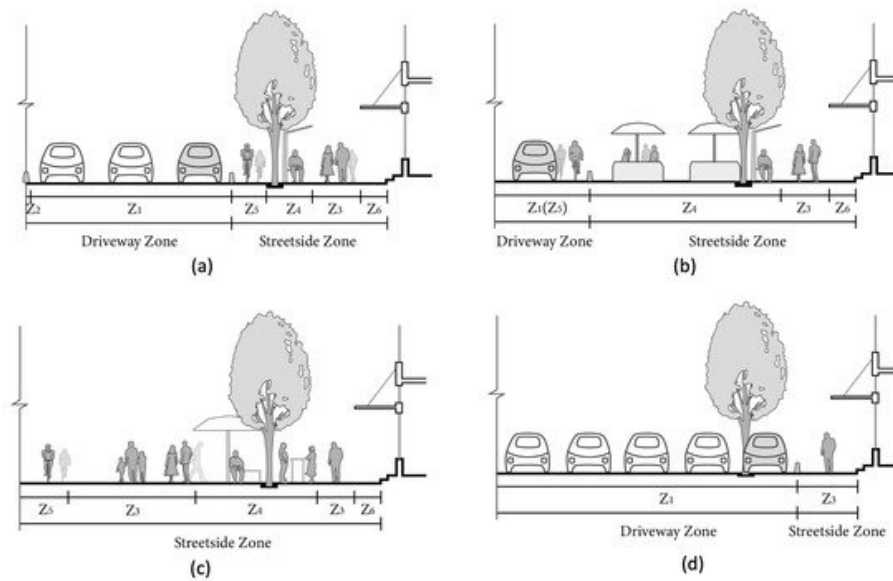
Examples of the Right-of-Way Plans. (a) A common complete street plan. (b) A pedestrians-prioritised plan. (c) A zero-driveway plan. (d) An automobile preferred plan. Note that White Cars indicates cars in the driving mode and grey cars in the on-street parking mode.
